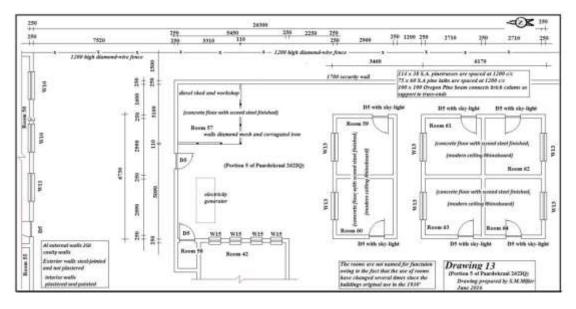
Above. Layout of rooms 56 to 64. (Drawing S.M. Miller 2016.)
